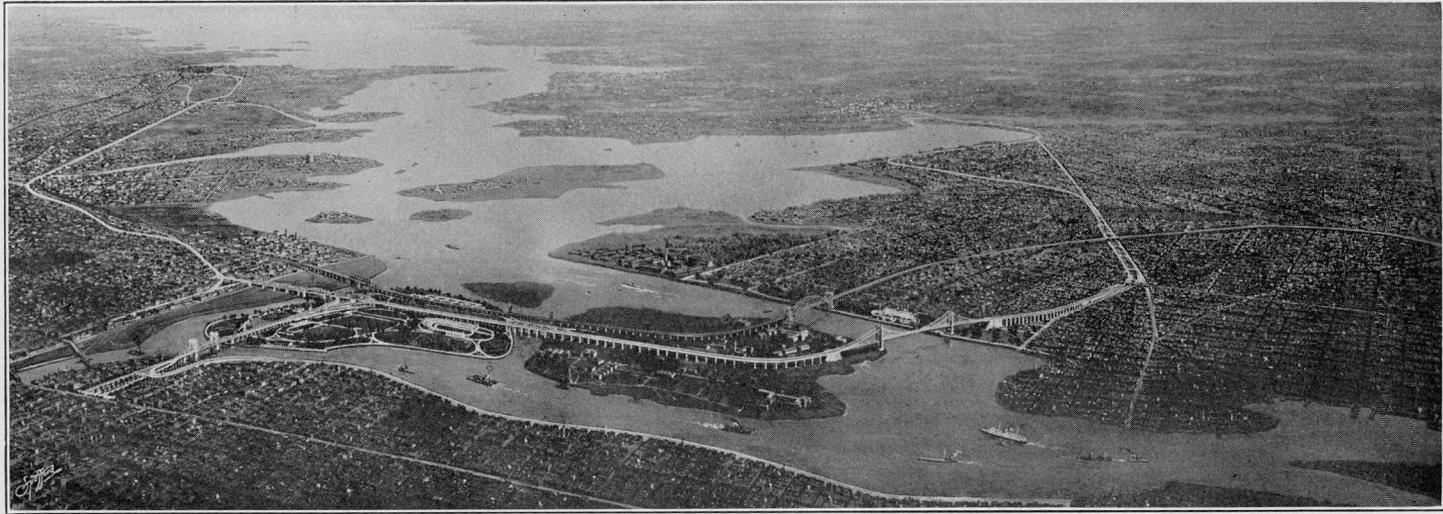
TRIBOROUGH BRIDGE AND APPROACHES
